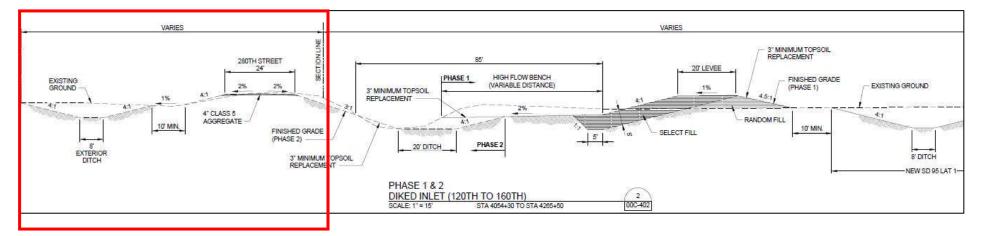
Typical Section of Diked Inlet (Impoundment to 120th Ave) - Altering Existing 280th St
